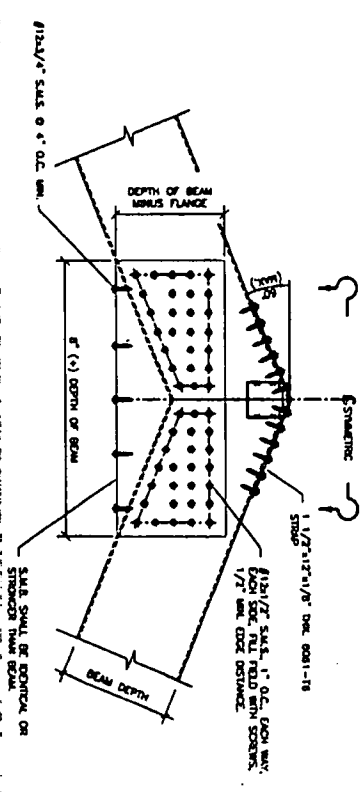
TYP. BEAM TO HOST STRUCTURE CONNECTION
